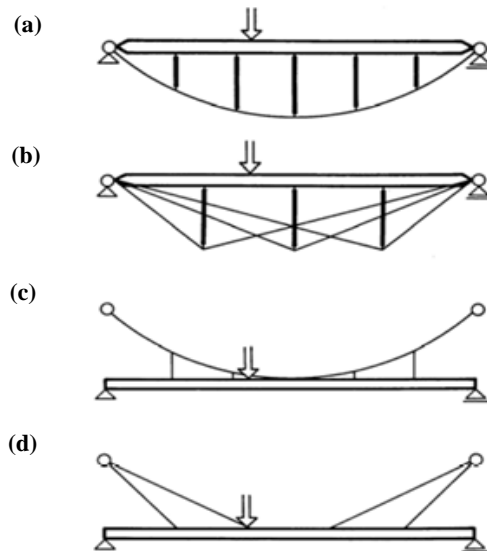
Suspension bridge structure with a stiffening beam: (a) footbridge structure with a suspended cable, (b) footbridge structure with cable stays, (c) a suspension structure with a cable, and (d) a suspension structure with cable stays (Strasky, 2011)
